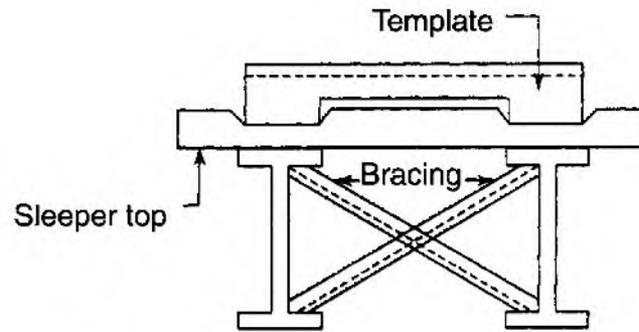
(d) Checking of notches surfaces to be in one plane
